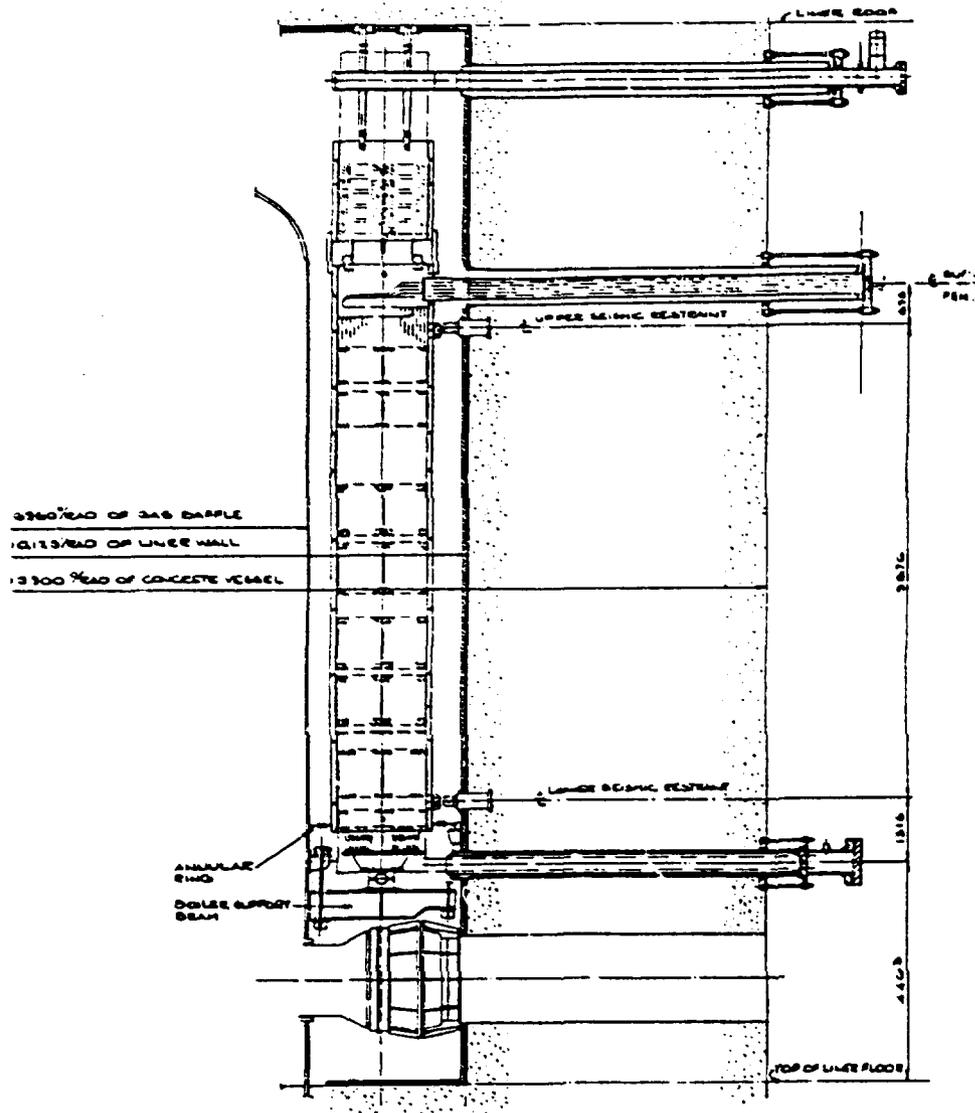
Sectional elevation through a boiler and outer pressure vessel wall.
